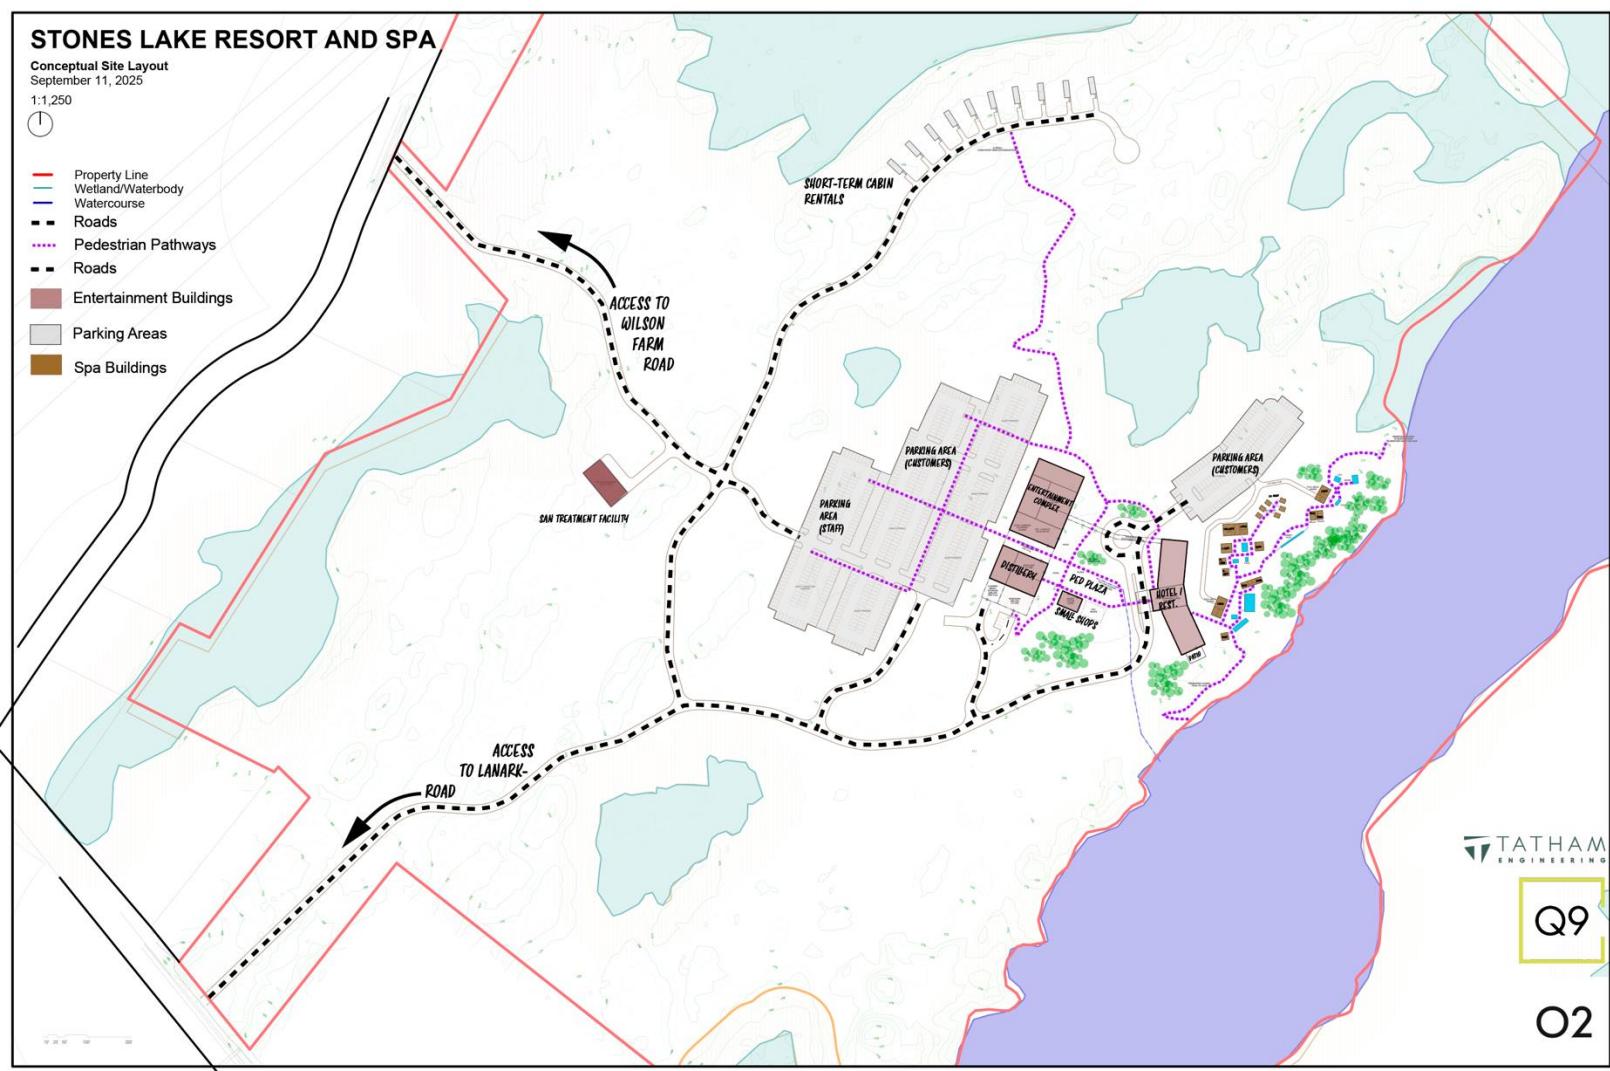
Concept Site Plan, Prepared by O2 with markups by Q9
